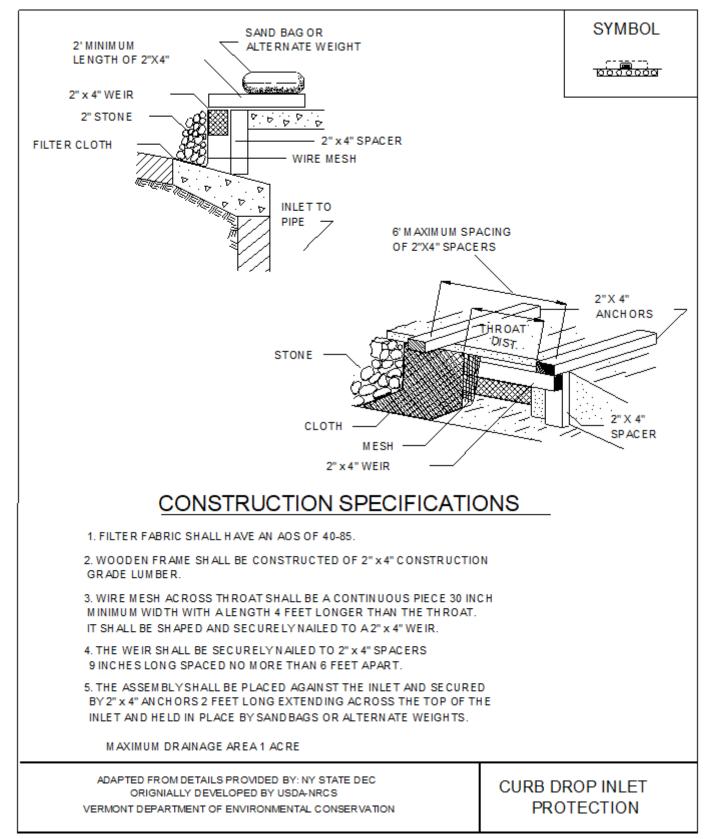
Storm Drain Inlet Protection: Curb Drop Inlet
